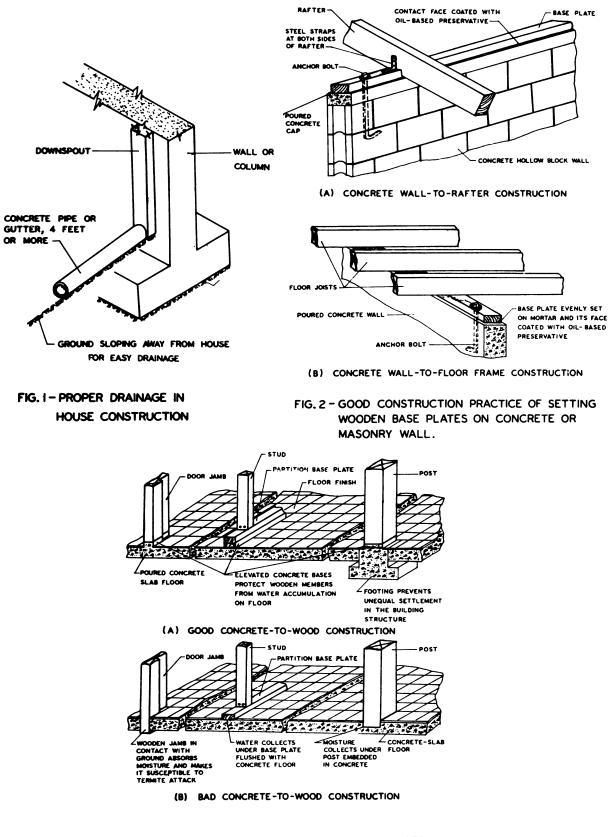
GOOD AND BAD CONSTRUCTION PRACTICES OF PLACING WOODEN MEMBERS IN CONTACT WITH CONCRETE FLOOR SLAB.
